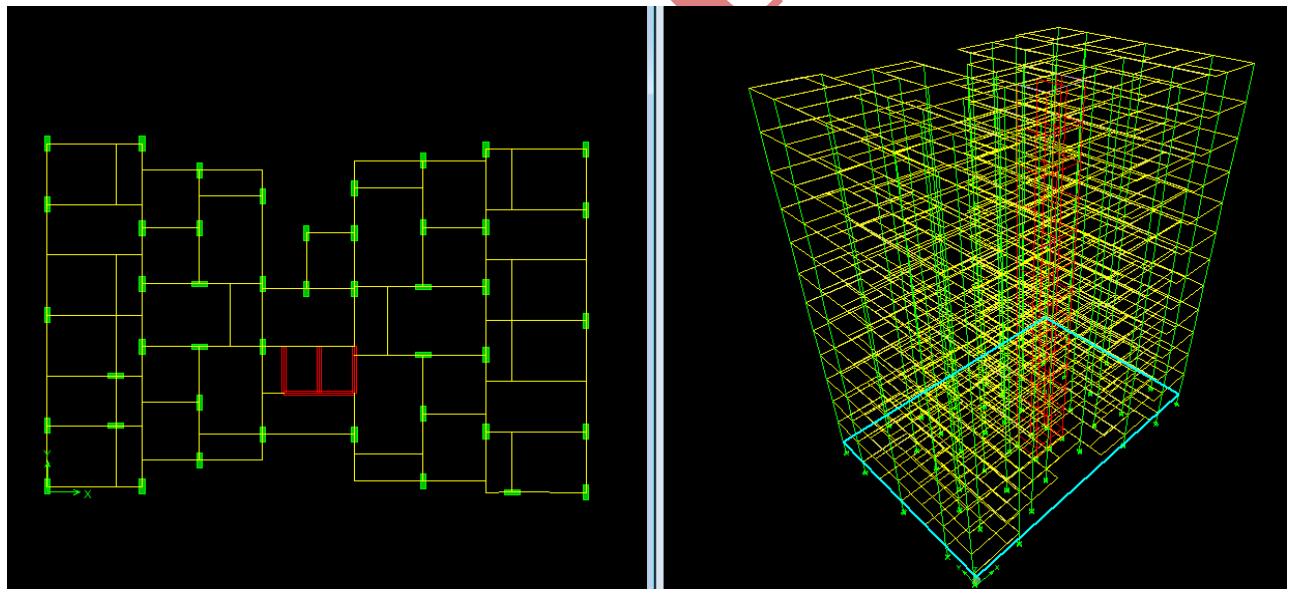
Plan and 3D view of G+12 RCC multistory residential building in ETABS9.7.2
